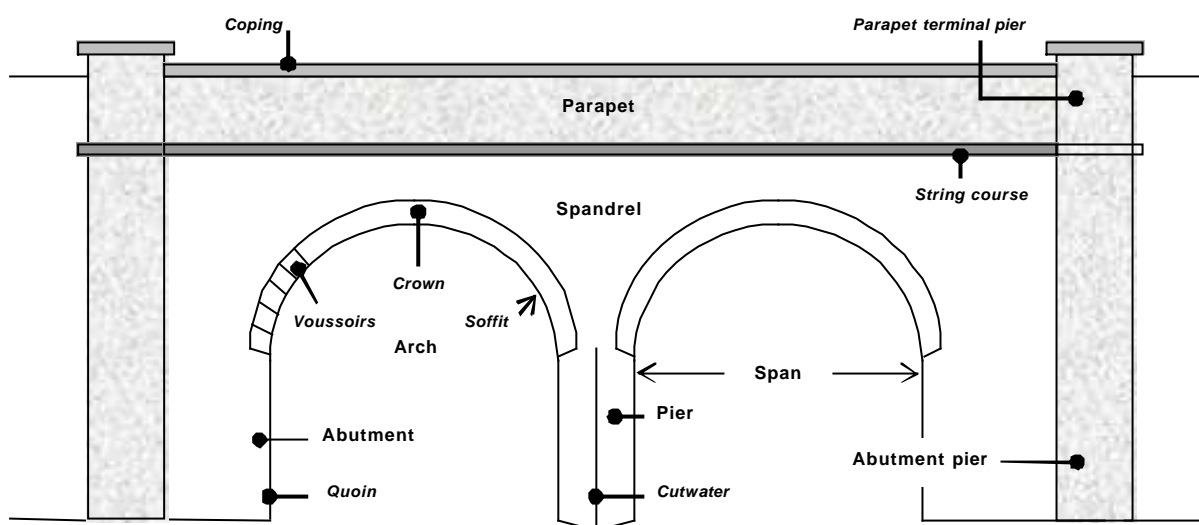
Principal elements of a typical masonry arch bridge carrying a road or railway over a river.
